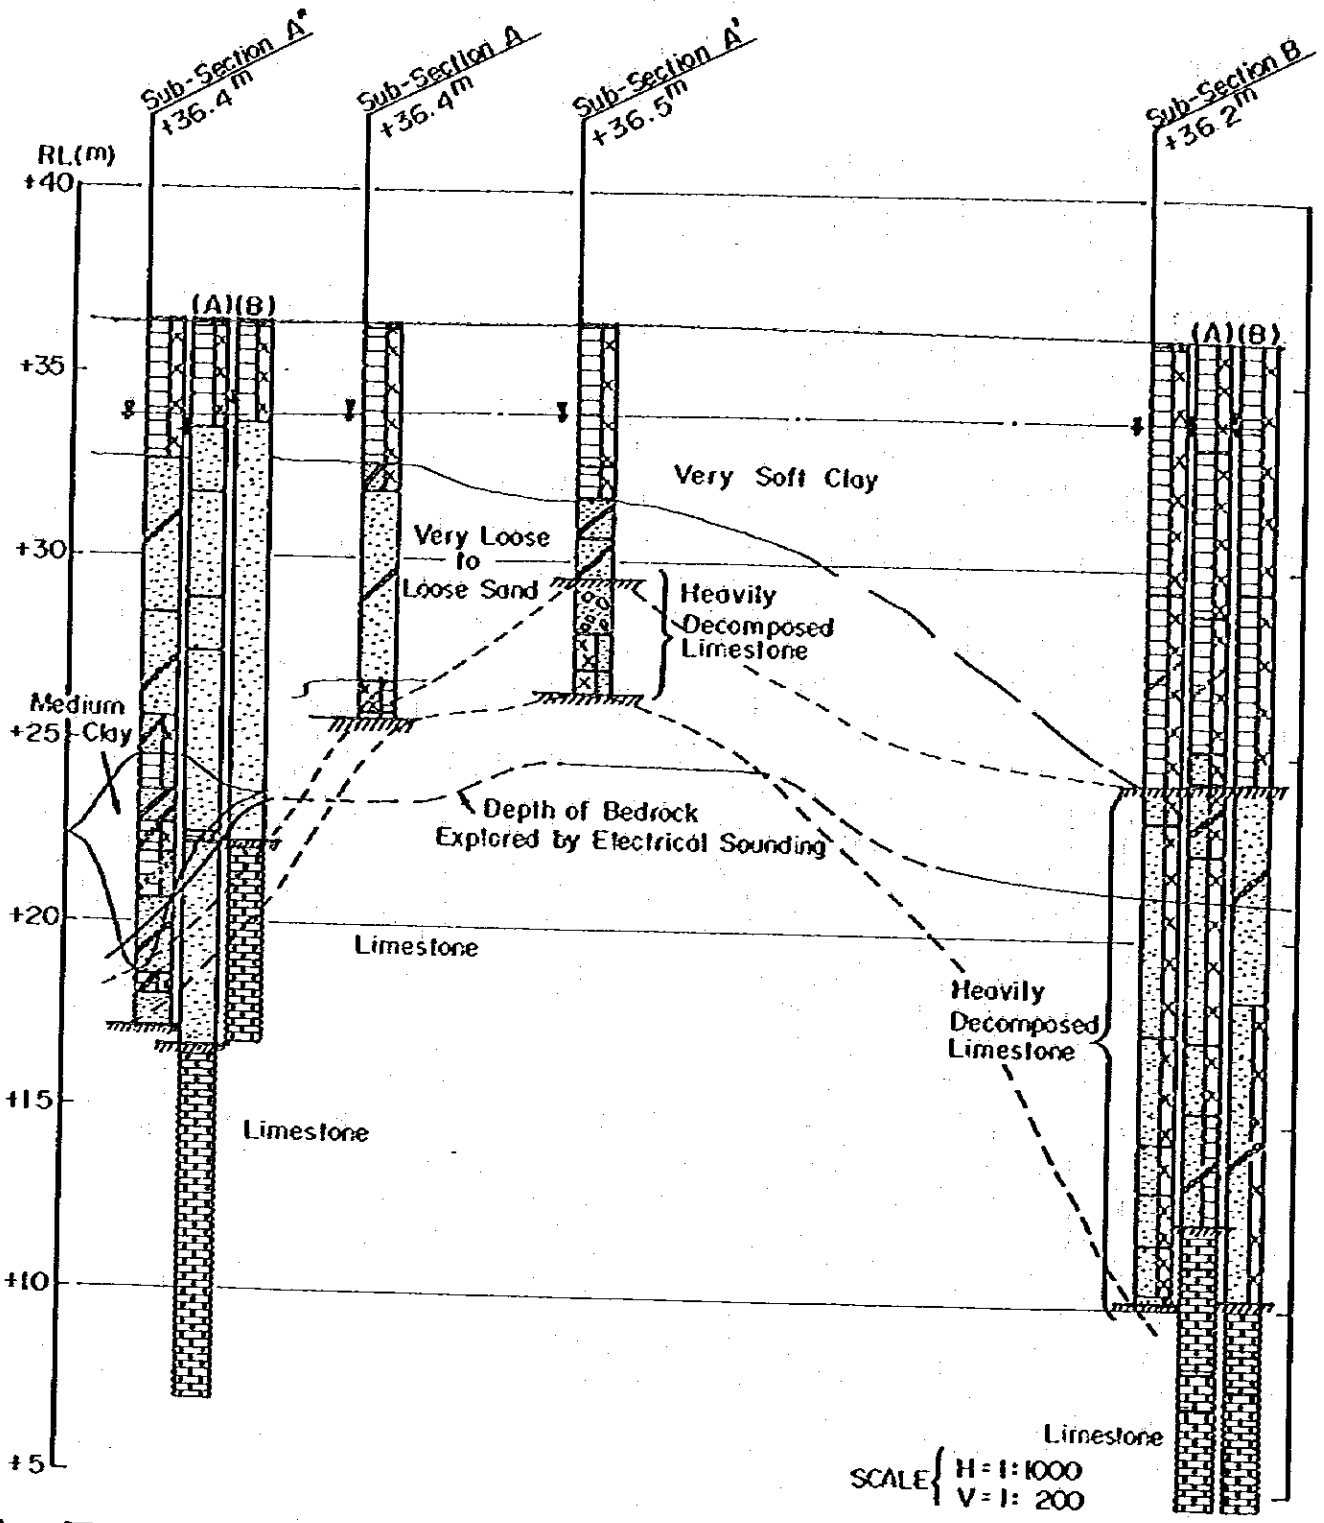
Soil Profile, Cross Section of Pilot Test Area
